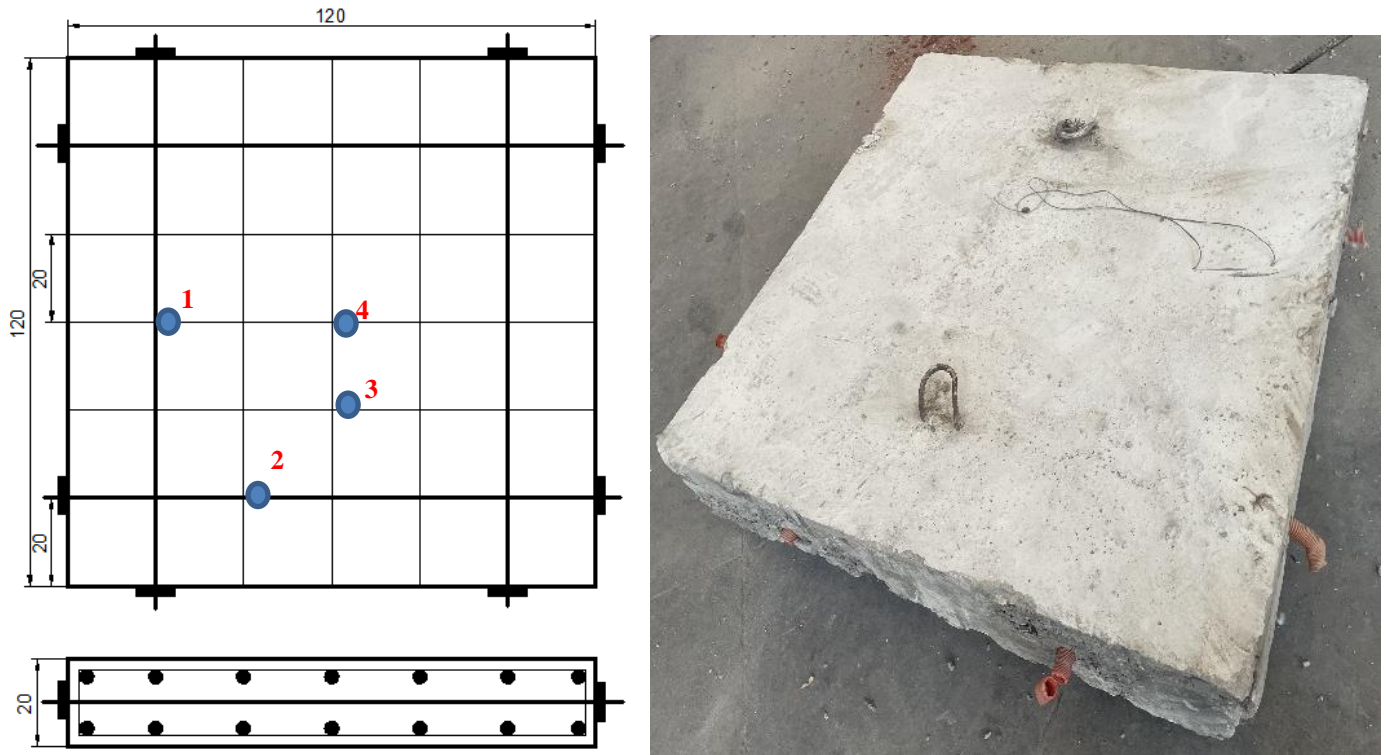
Typical Steel arrangement details of PT slab No (S3) and strands distribution.
